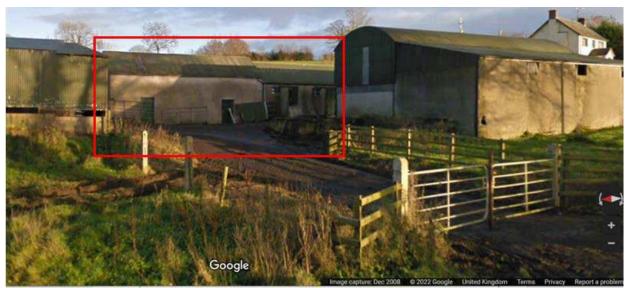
Google image of building as it stands today on site captured in December 2008. The surrounding agricultural building have since been removed and no. 92 Lisaclare Rd the associated dwelling see above to the northeast corner is in the process of being replaced under a recent planning permission.
